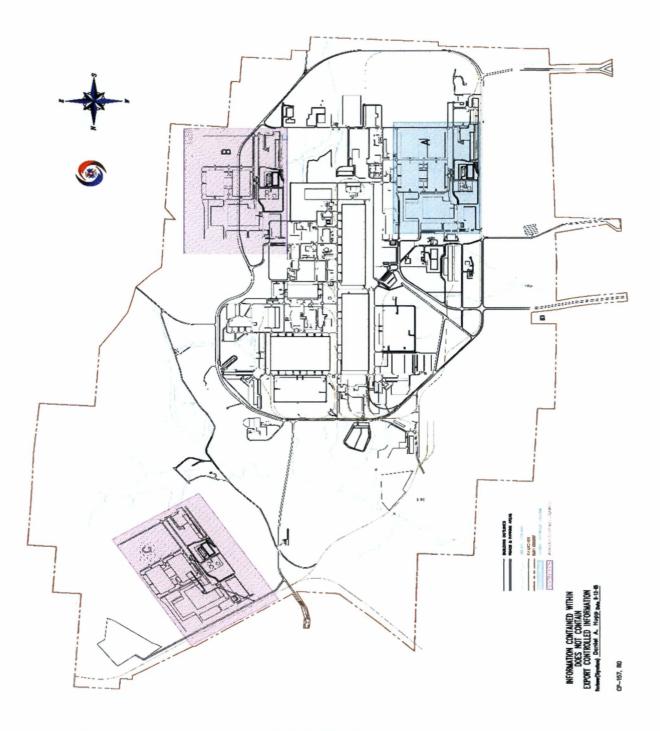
American Centrifuge Plant Alternative Locations on the U.S. Department of Energy Reservation
